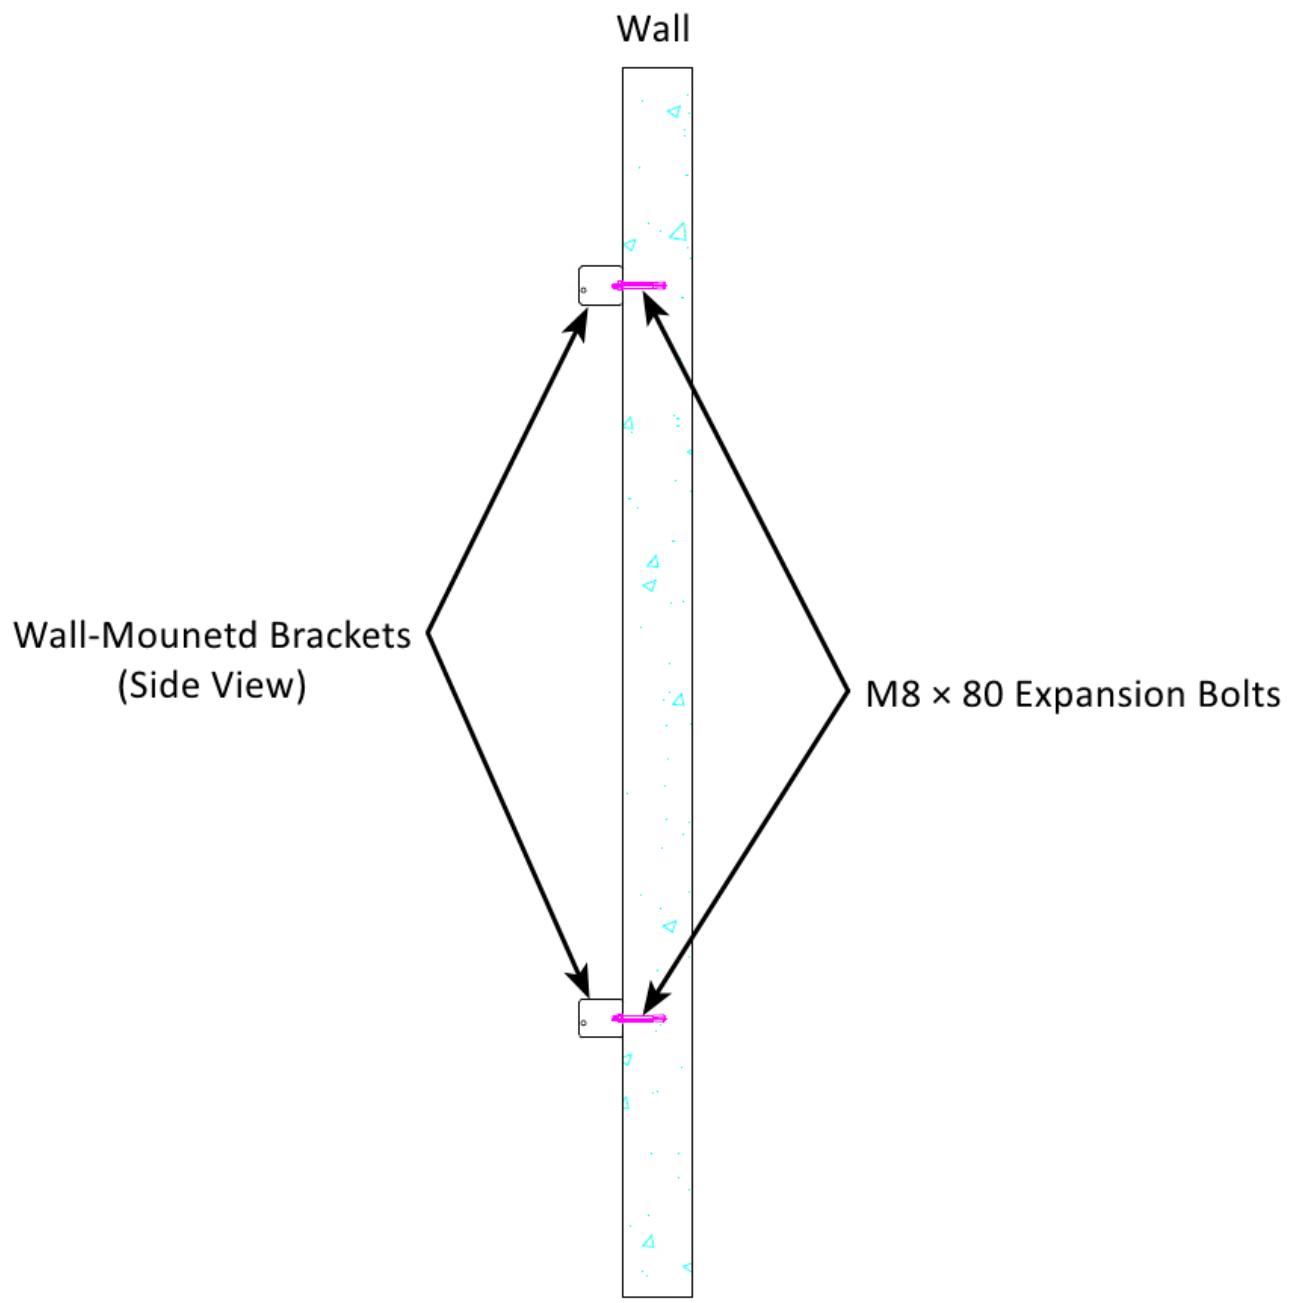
Install Wall-Mounted Brackets onto the Wall (Side View)
